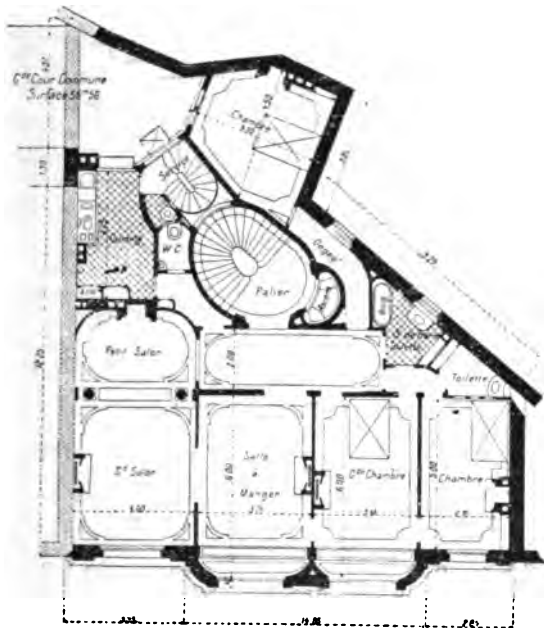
PLAN OF SMALL APARTMENT-HOUSE, RUE DANTON, PARIS. M. SINELL, ARCHITECT.
